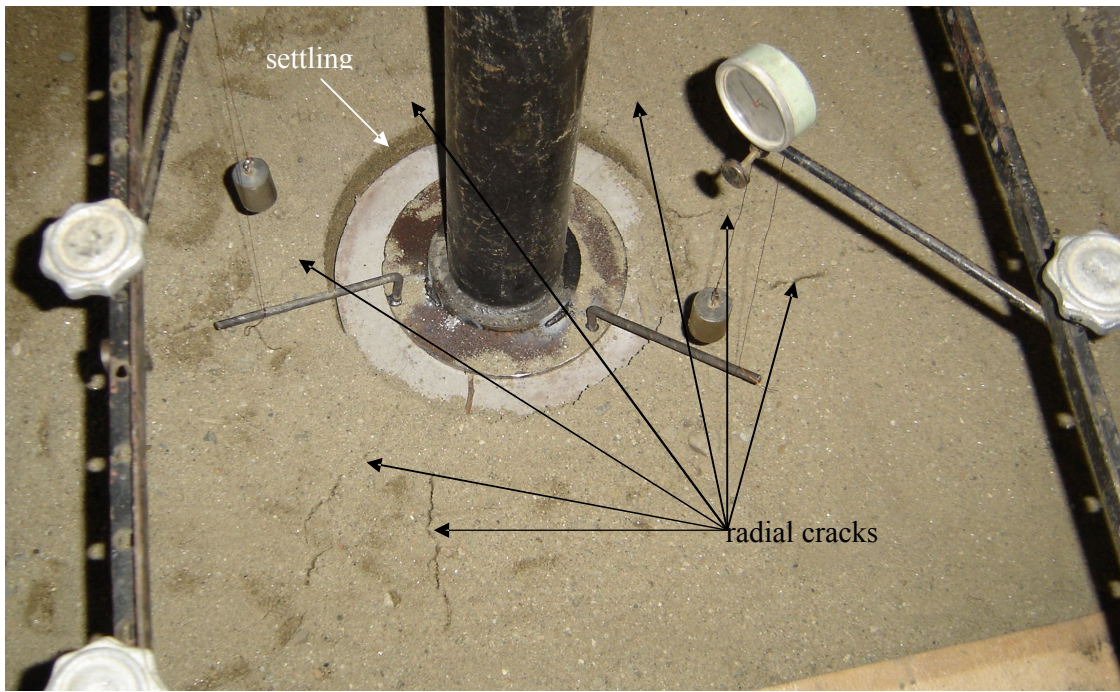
Yielding through radial cracking of the ground around the foundation
